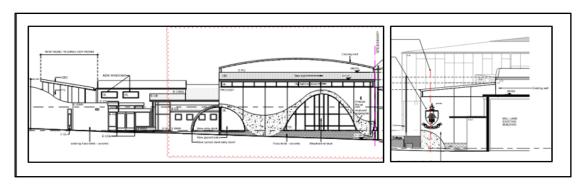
Bosco Centre - East and North Elevation-Luttrell Pyfinch Architect
